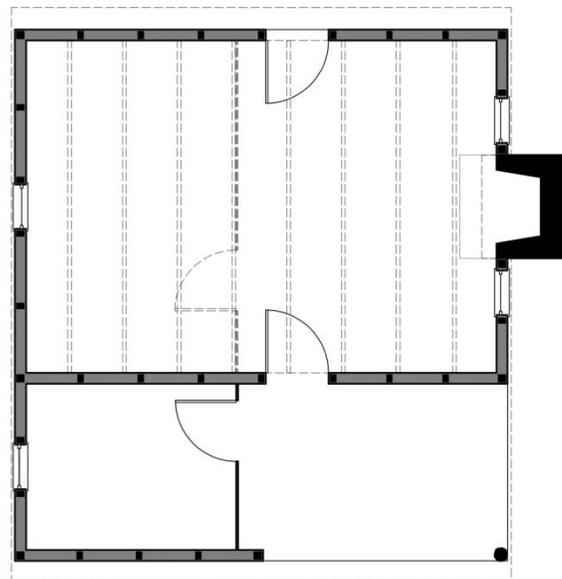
Tenant Cabin. Existing plan. Possible original partitioning of large room indicated to left of door.
